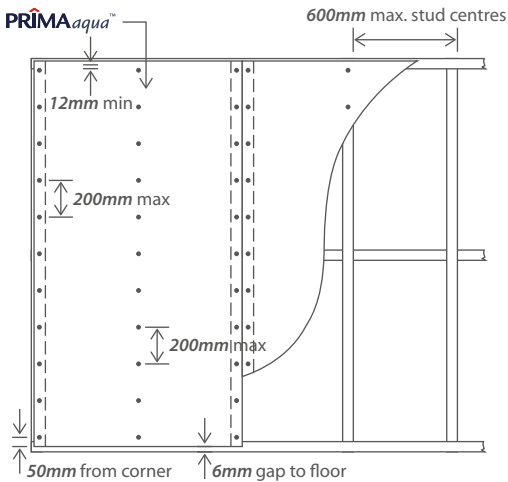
Vertical Sheet Fixing (Untiled Wall)
